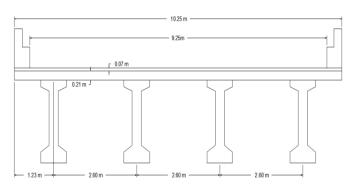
Cross Section of Pre-stressed Concrete Girder
